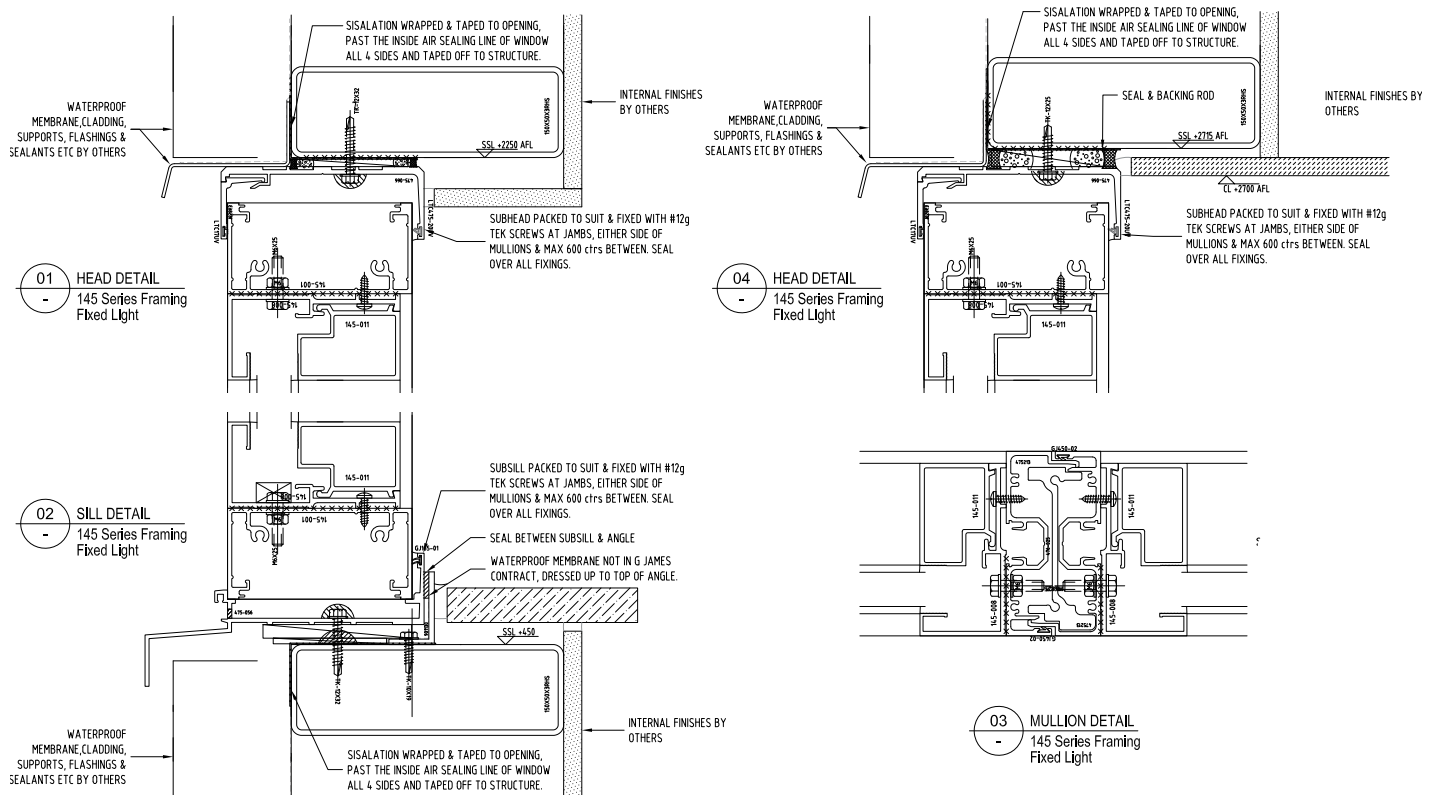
Australian Institute of Tropical Health and Medicine, fixed glazing details at openings in concrete wall. © G. James Glass & Aluminium
